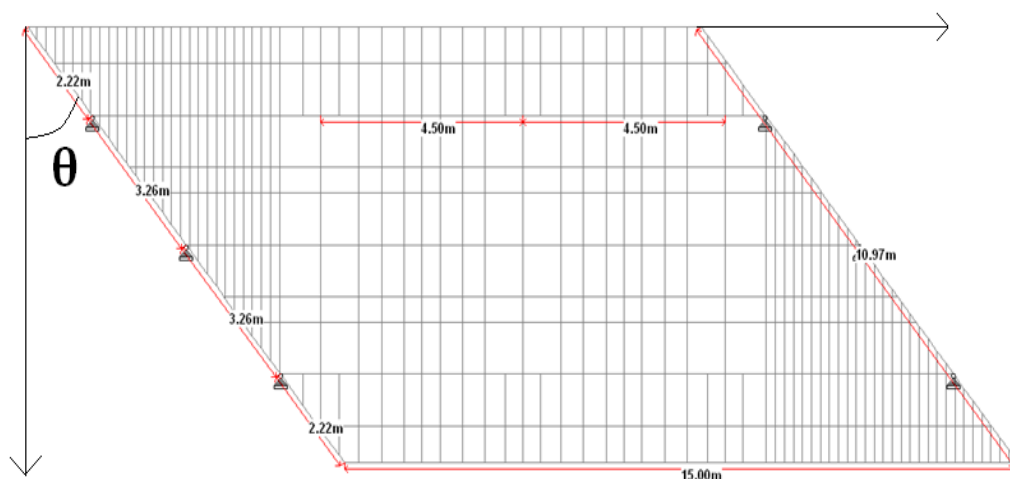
Typical plan of grillage model of 15 m span (skew bridges,  $\theta \geq 150$ )
